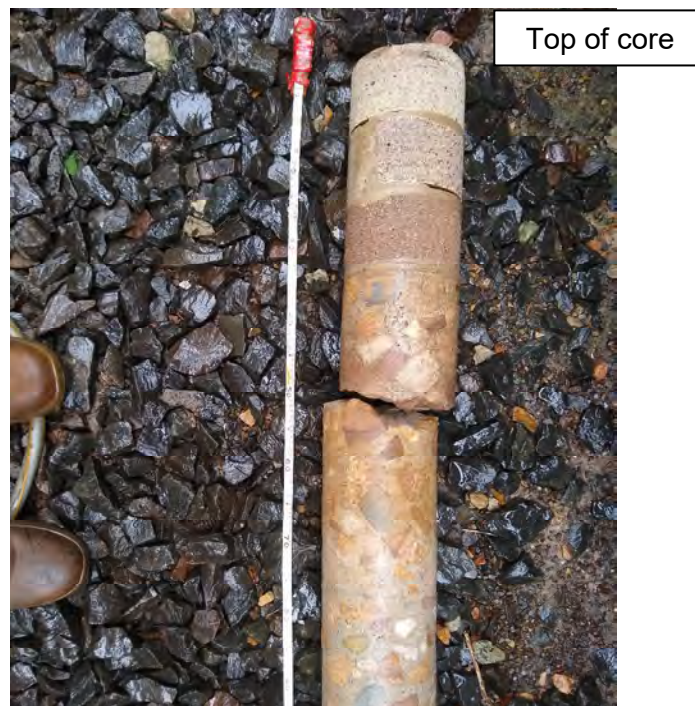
View of concrete core from Borehole BH105 (below 0.1 m depth), showing a brick pavement mortared onto concrete with high strength sandstone inclusions (cyclopean concrete).
